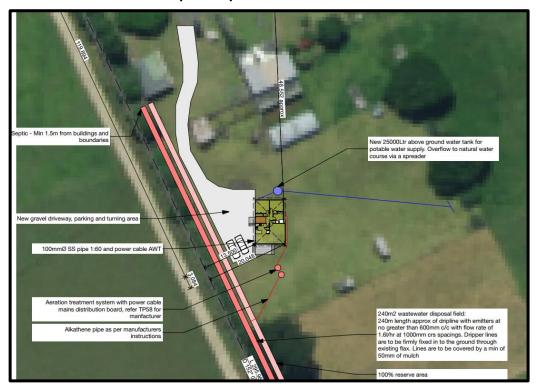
Site Plan showing approx. location of relocated dwelling and existing buildings on the site.
